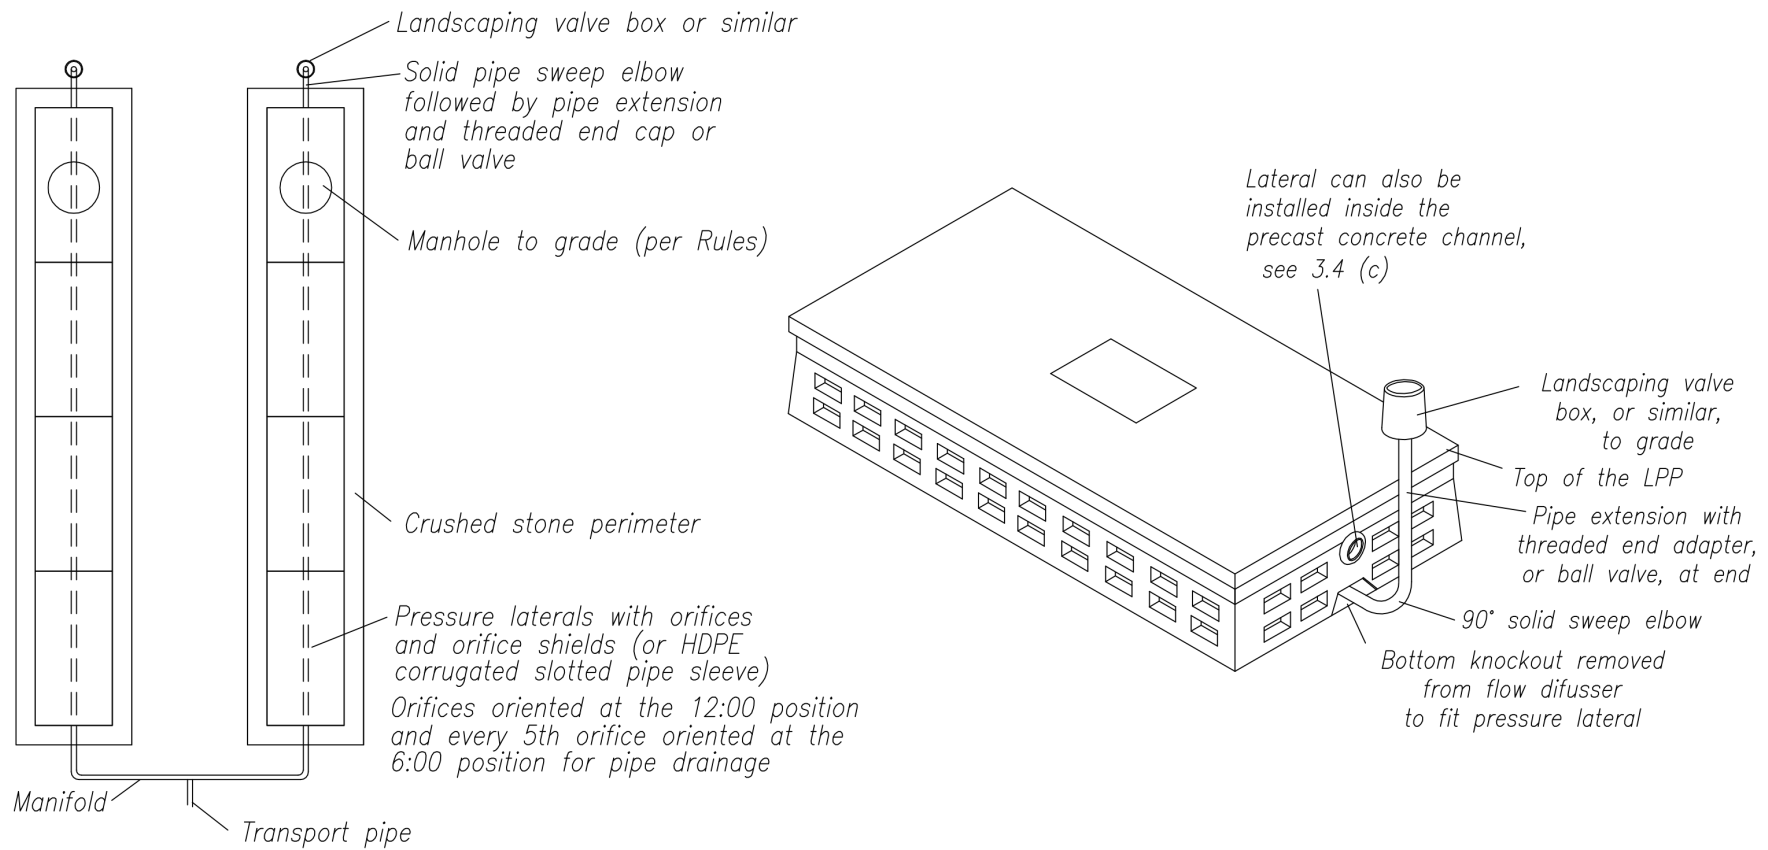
LPP DETAILS FOR SHALLOW CONCRETE CHAMBERS (TOP AND ISOMETRIC VIEWS)
